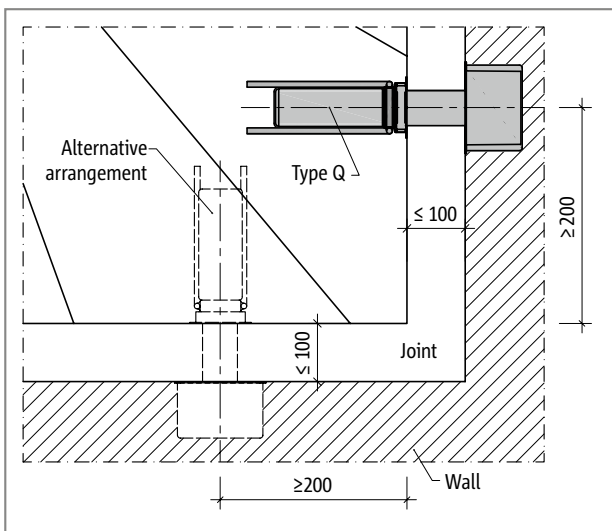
Schöck Tronsole® type Q: Component configuration, Detail B
